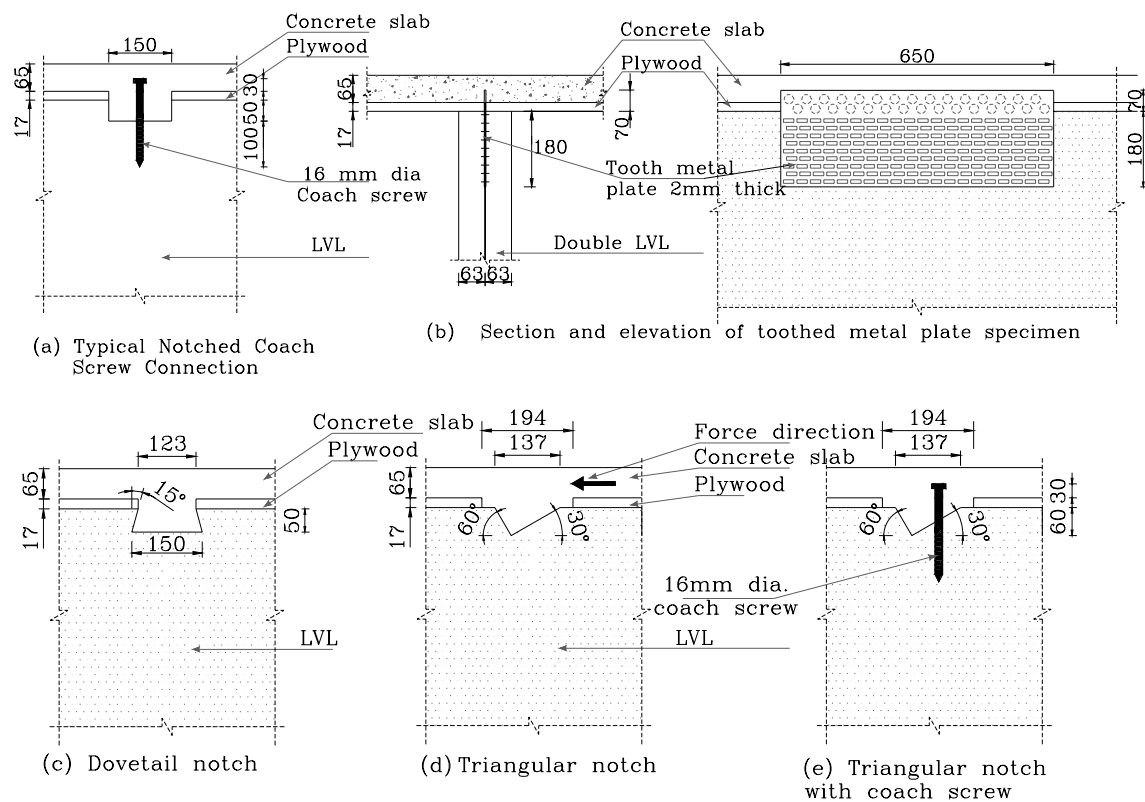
Typical notched coach screw and toothed metal plate connections (dimensions in mm)
